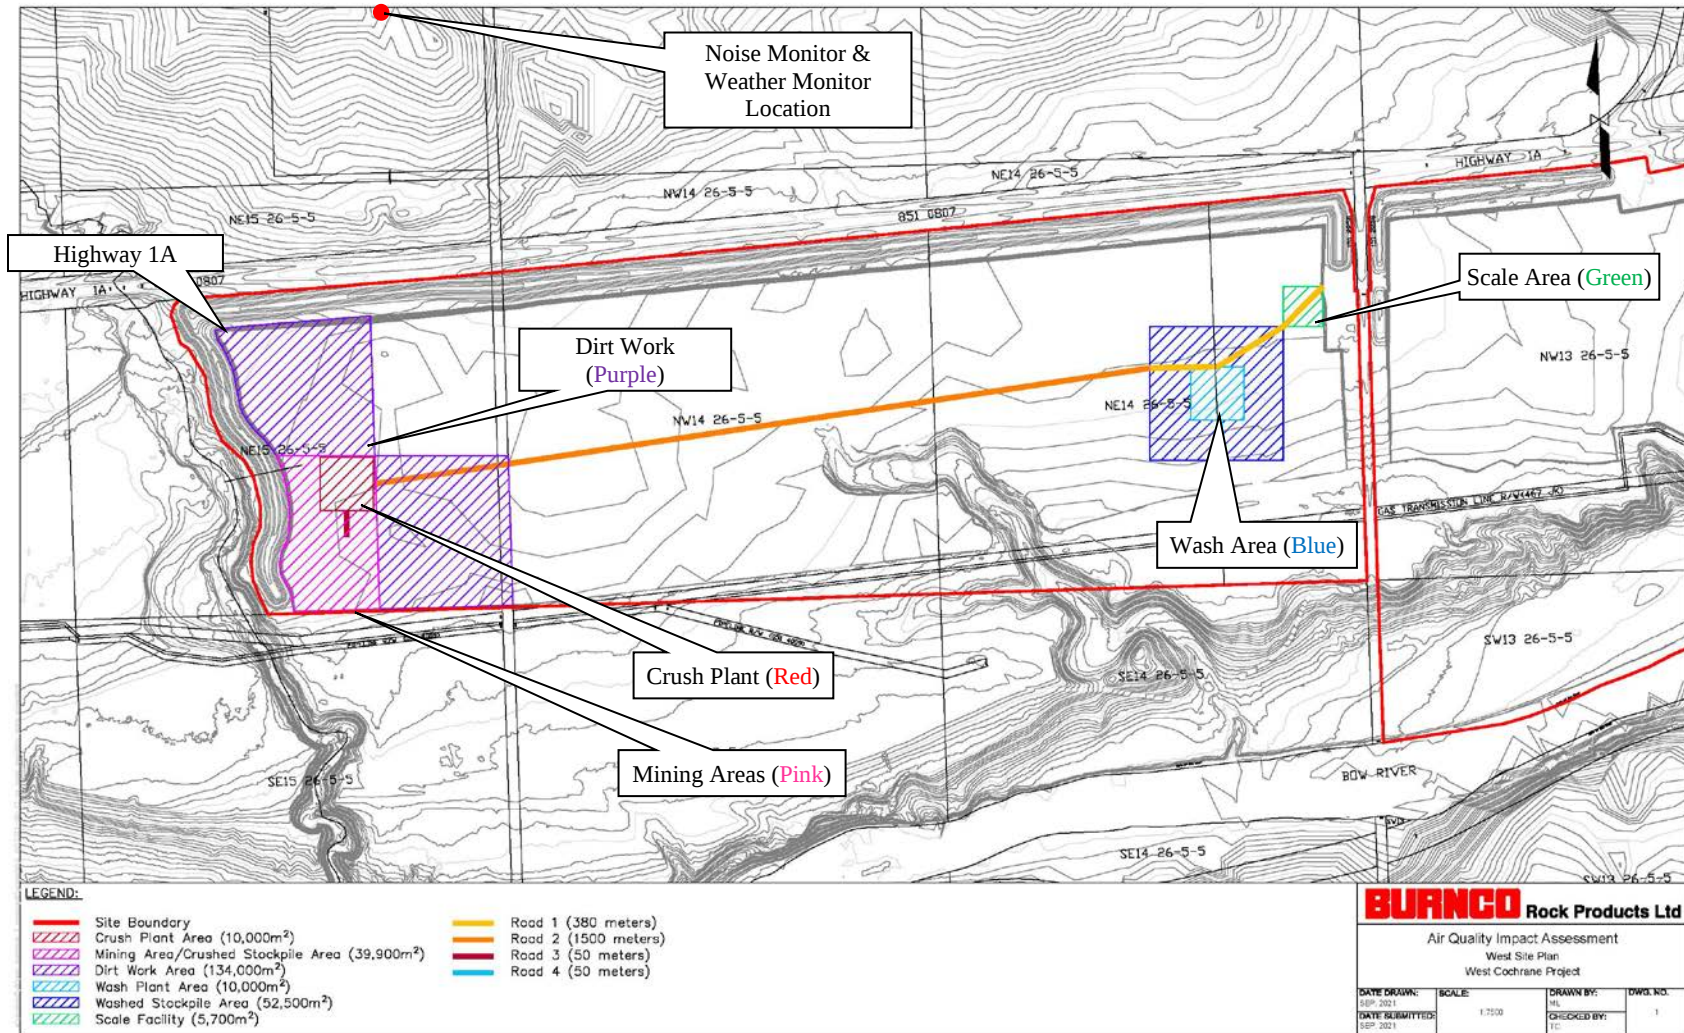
Study Area – West Cochrane Gravel Pit #2 Operations Site Plan
